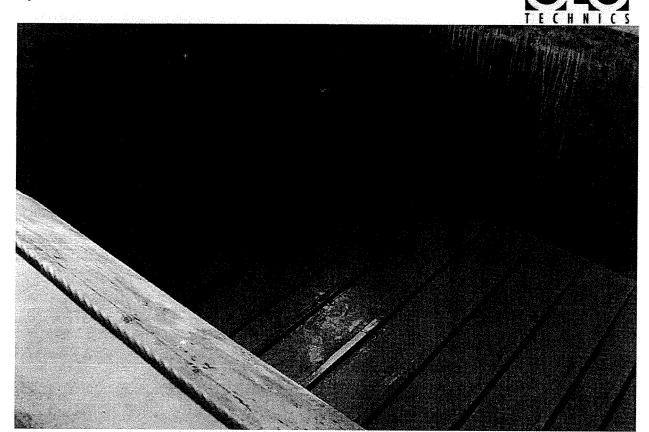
Primer coat of epoxy is applied to the prepared concrete floor and walls.
